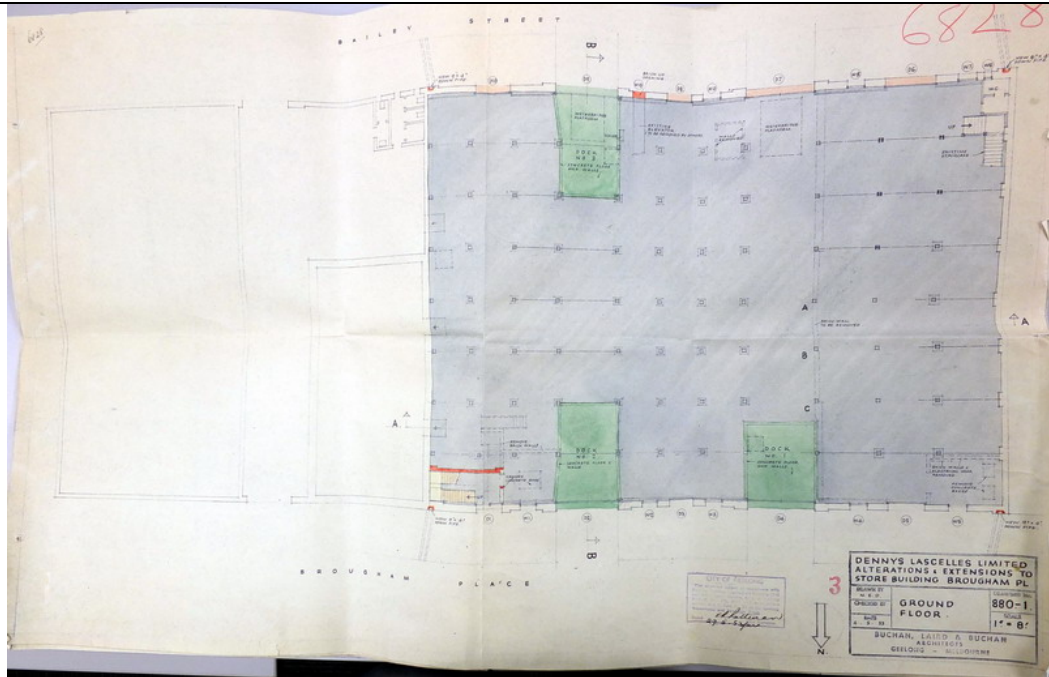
Buchan Laird & Buchan, Ground Floor Plan, proposed additions to Dennys Lascelles Ltd, 4 May 1953. Source: City of Greater Geelong Building Permit file 6828/53.
